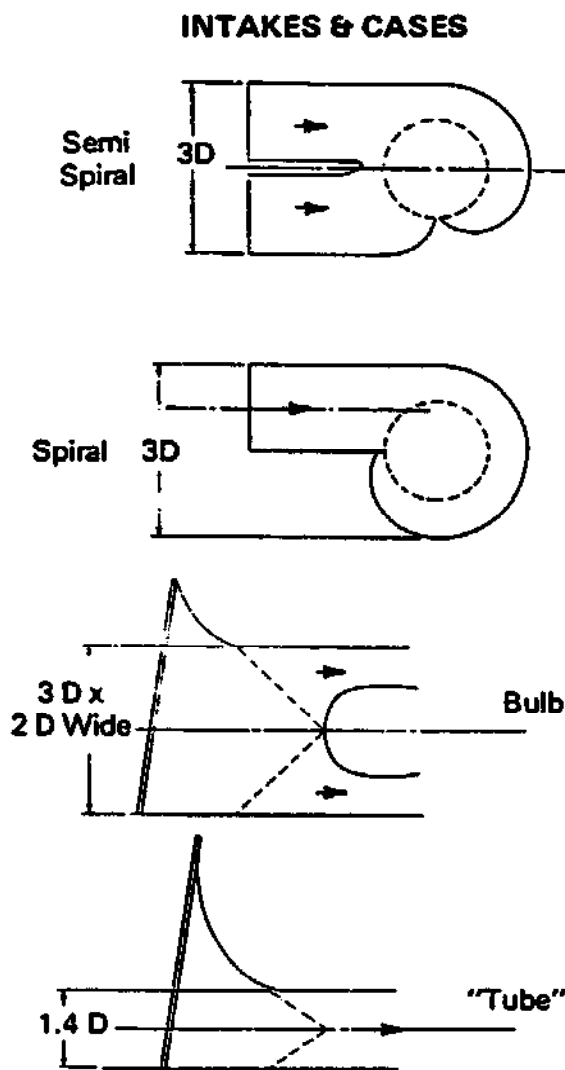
Typical intake and case dimensions. (Mayo, 1979)
